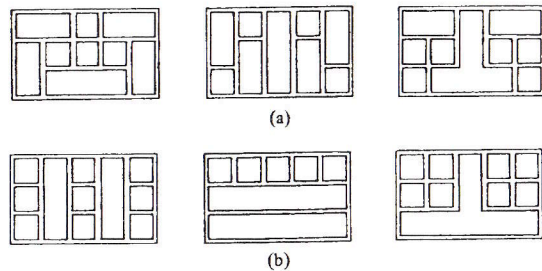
Plans shown in (a) satisfy proviso 1; plans in (b) fail to do so.
